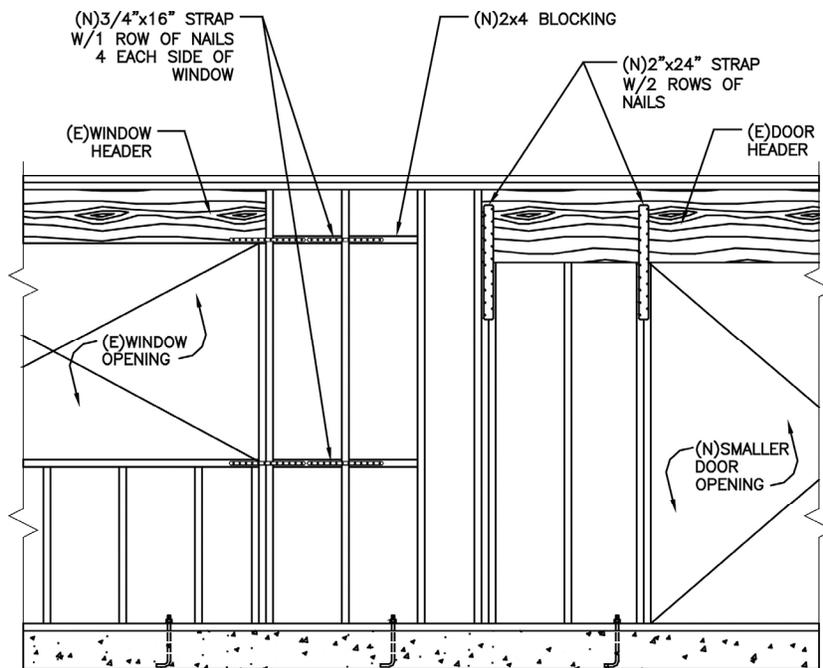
Wall with door and window openings and representative retrofit straps and blocking at inside corners (from ATC, 2002).
